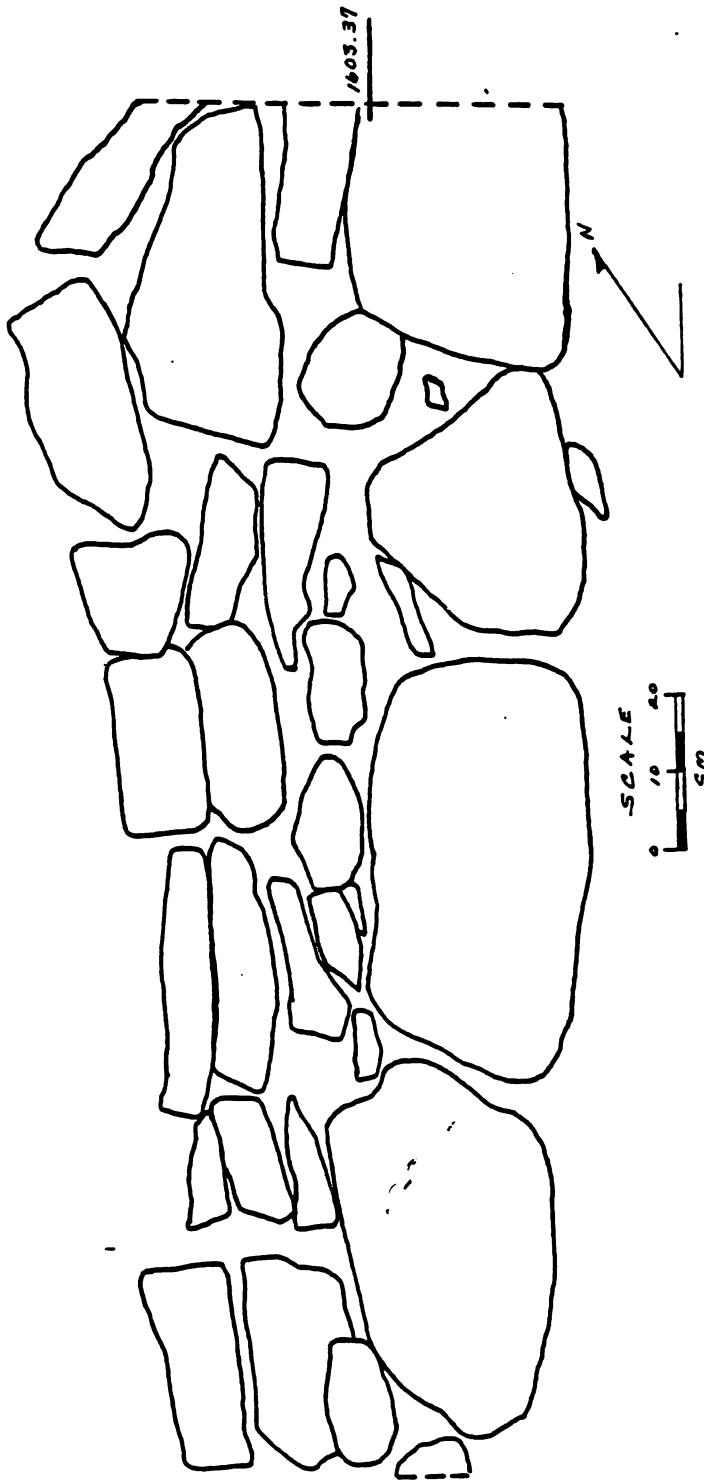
Horizontal courses in wall construction (C-102) from a room in the central roomblock at Shoofly Village.
